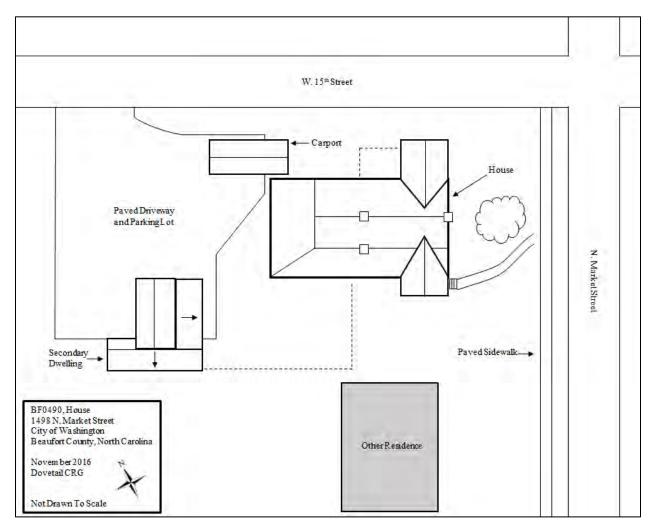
Site Plan for the House at 1498 N. Market Street (BF0490).
